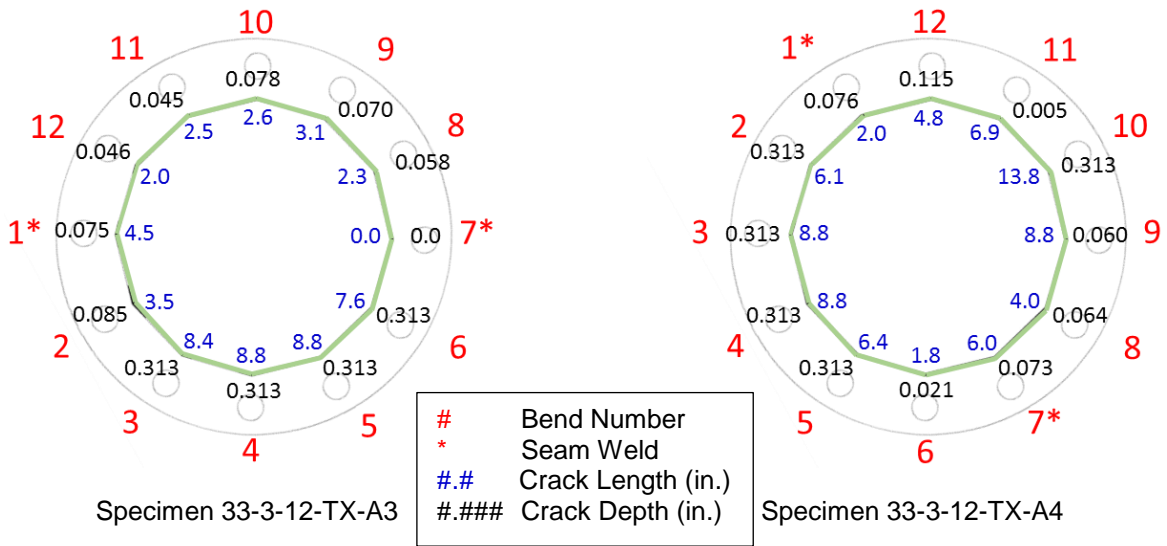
Specimens 33-3-12-TX-A3 and 33-3-12-TX-A4: Cracks after 22.6 Million Fatigue Cycles in Test 6
